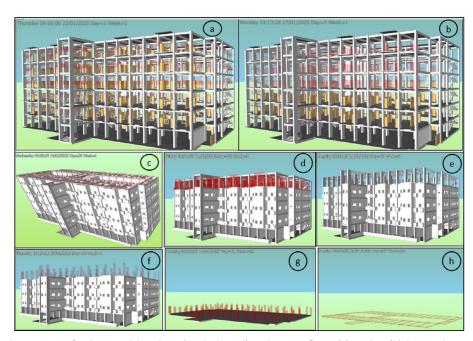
Integrated sequencing of architectural demolition (marked in red) on the 5, 4, 3 floors, (a) window, (b) door; and sequencing structural demolition on the 5th floor (marked in red), (c) floor structure, (d) wall, (e) beam structure and stair, (f) column structure, and demolition on base floor, (g) column structure, (h) beam structure (printed screen 4D BIM from Naviswork)
